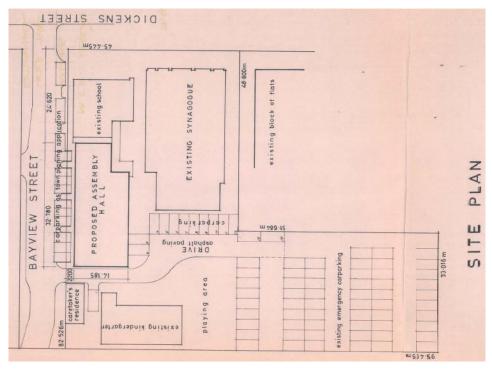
Drawing related to building permit 7845. Site plan (Nicholas Katris & Assoc. June 1979) (Source: Council Building File)
